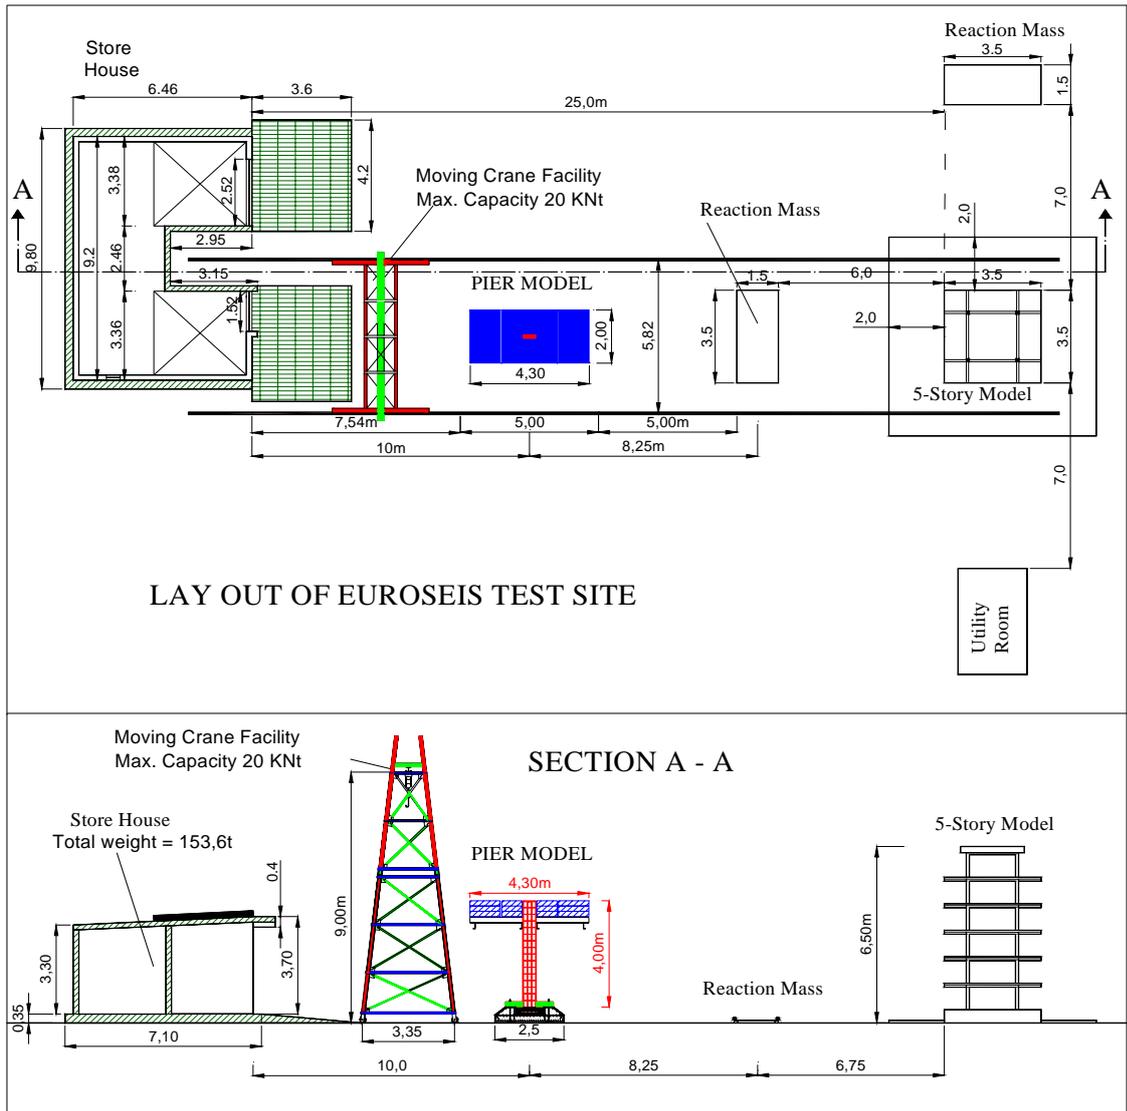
Lay-Out of the model structures and the facilities at the European test-site (Volvi-Greece)
